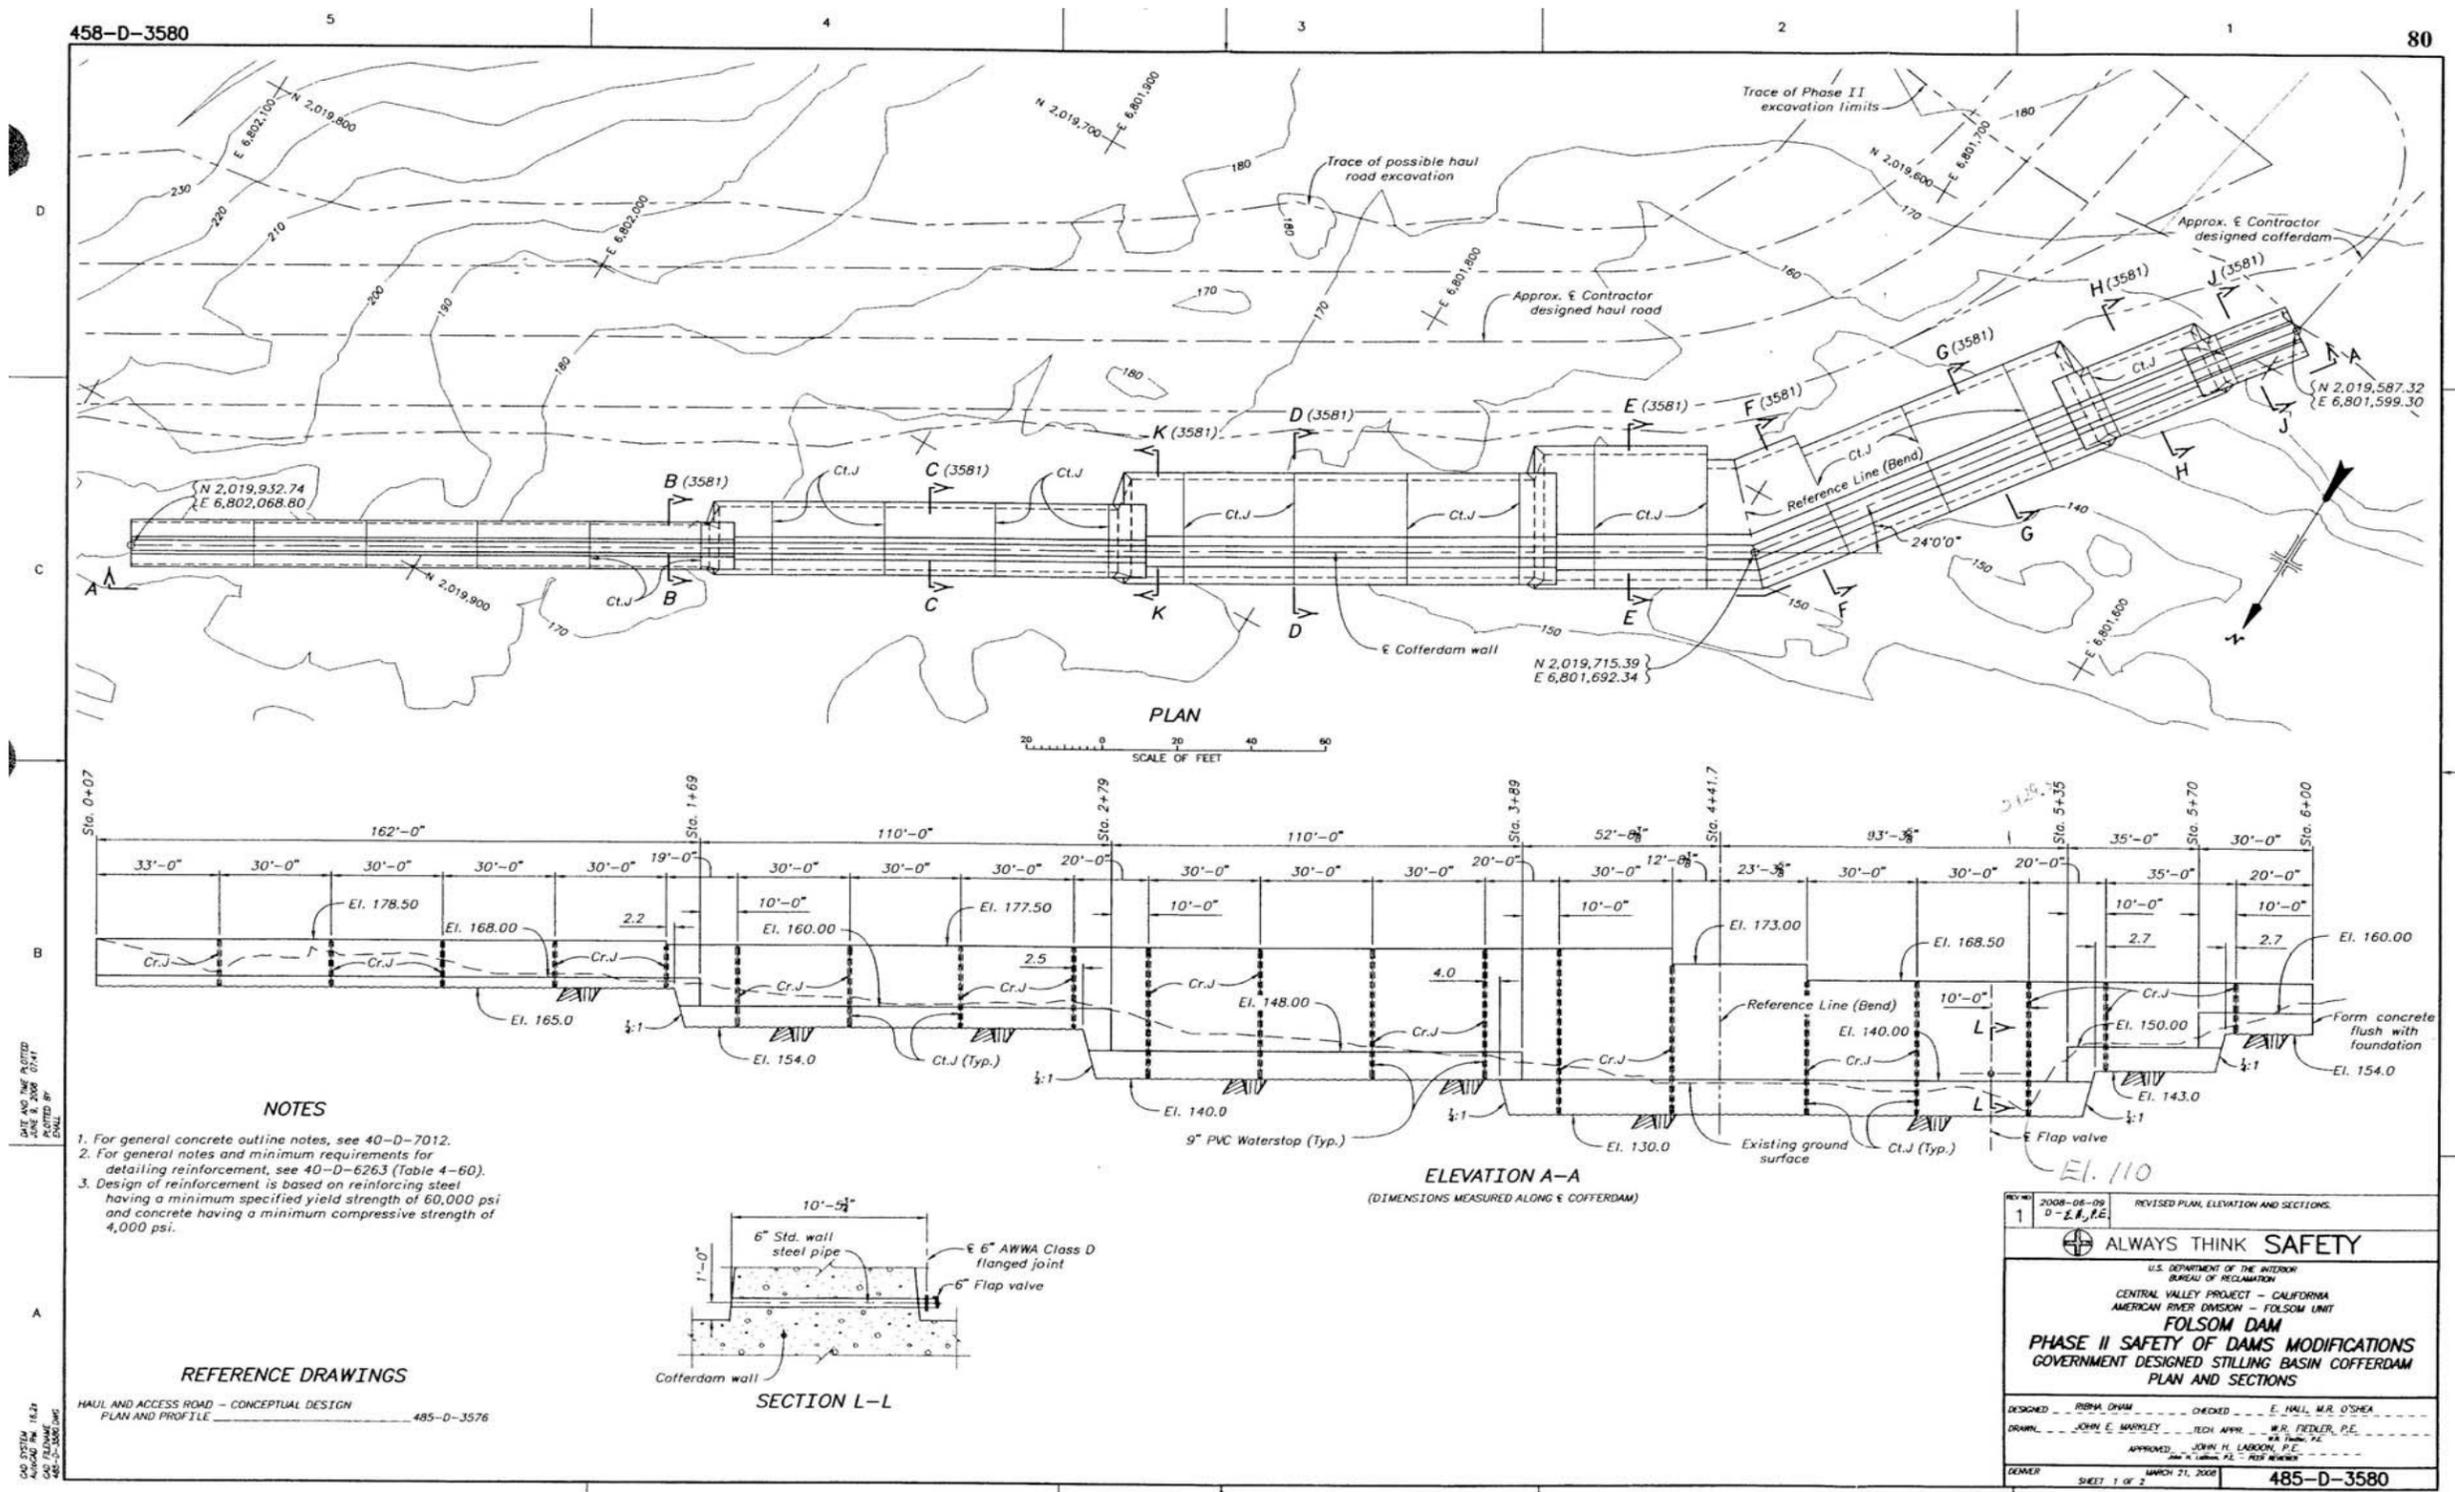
Construction drawing of government-designed reinforced concrete cofferdam section.
